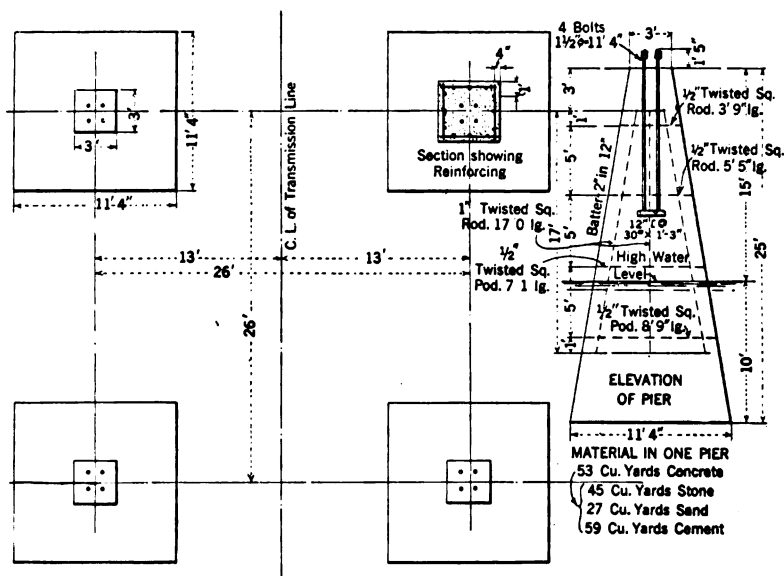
FOUNDATION PLAN FOR LAKE TOWER
